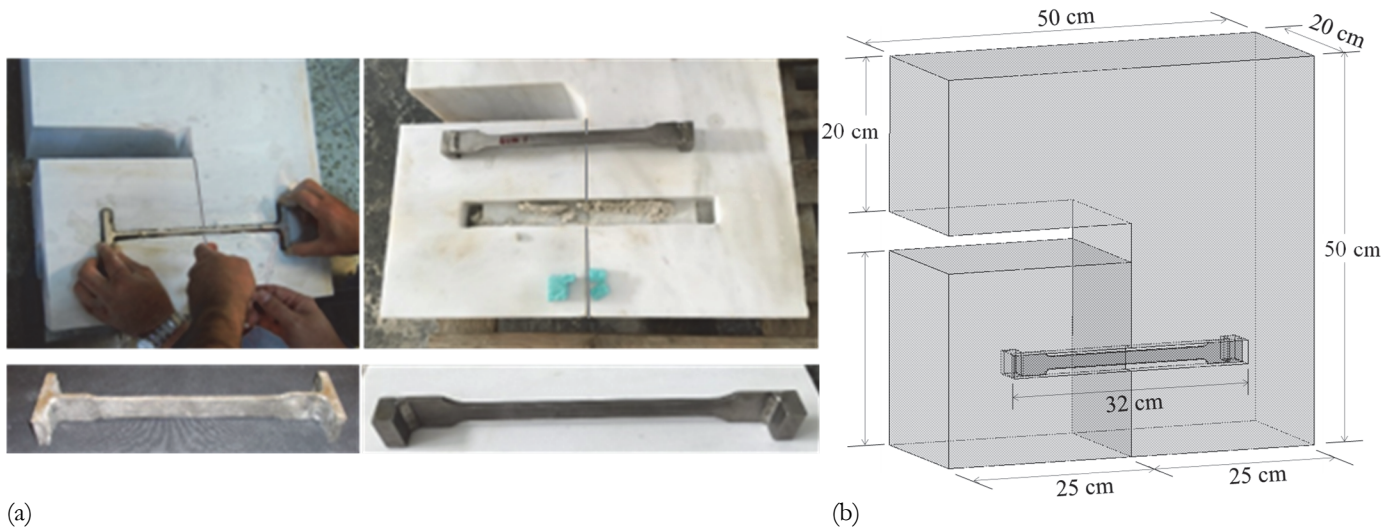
(a) Typical specimens to be loaded under shear. Connection is achieved by either an “I”-shaped connector (left) or by a “II”-shaped one (right); (b) The geometry and dimensions of the two interconnected blocks forming the “specimens”.
